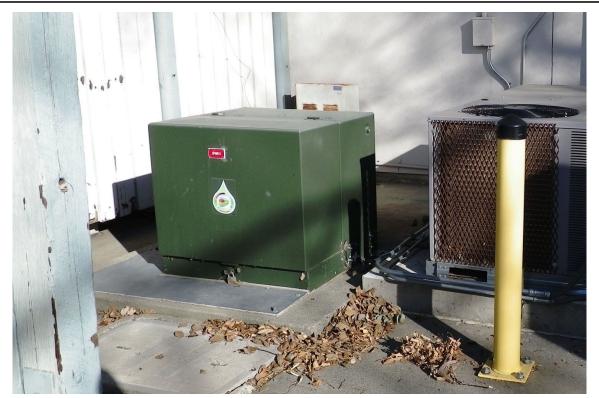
Pad-mounted transformer adjacent to the west of Building 5400
